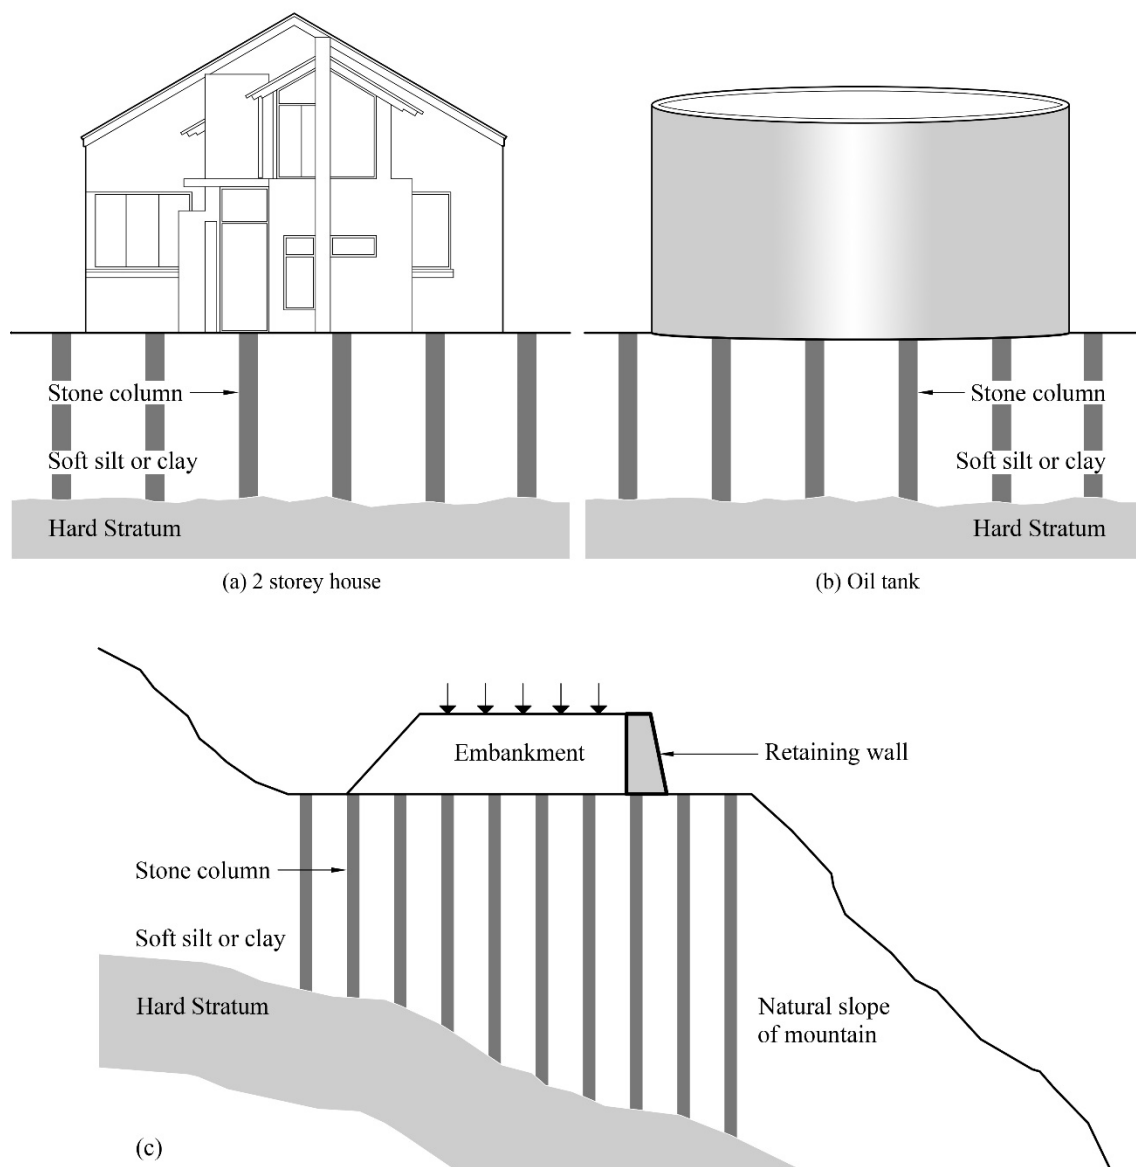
Typical examples of low capacity structures supported on granular columns
